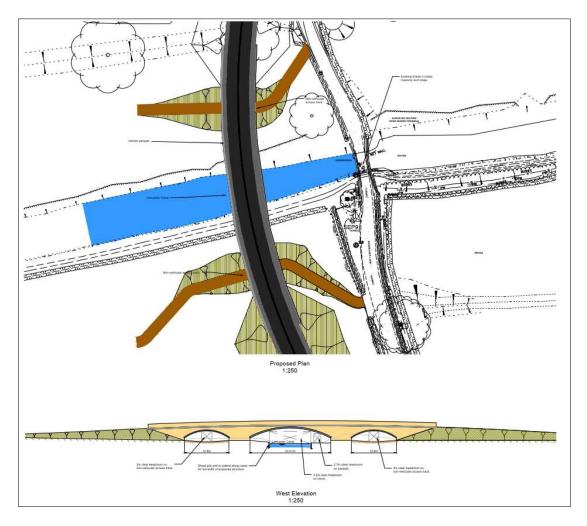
Proposed design of the access road bridge which crosses the Lancaster Canal, cruising section (GB GB71210228)
